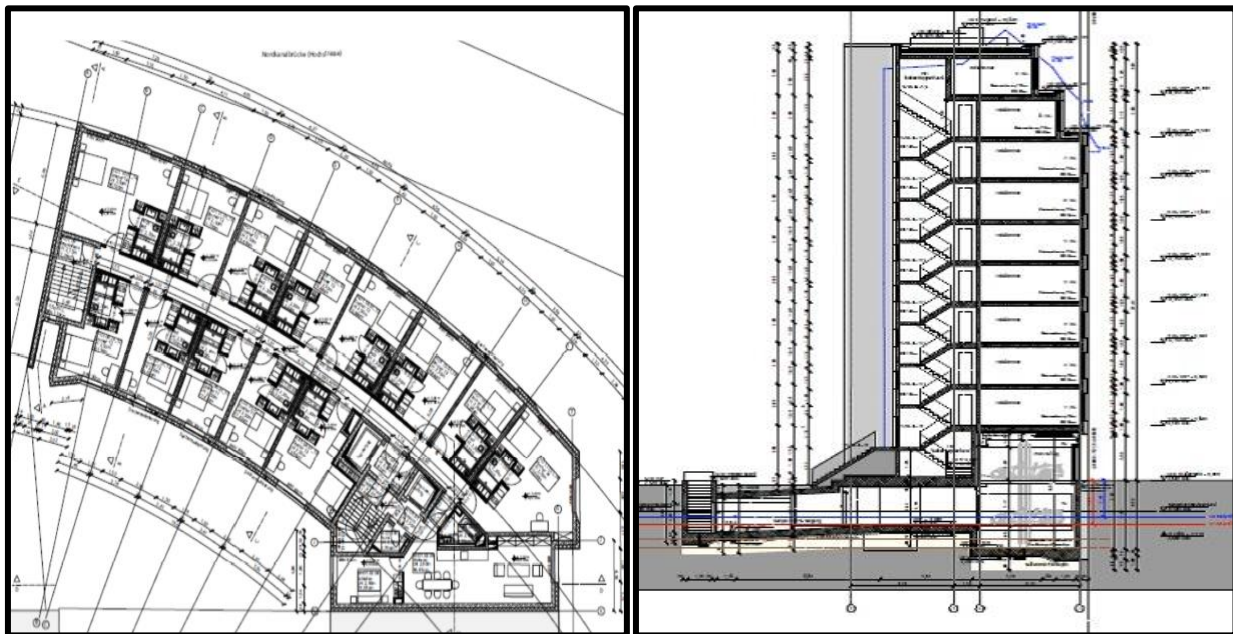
SEAZ hotel floor plan and section⁷⁶.
